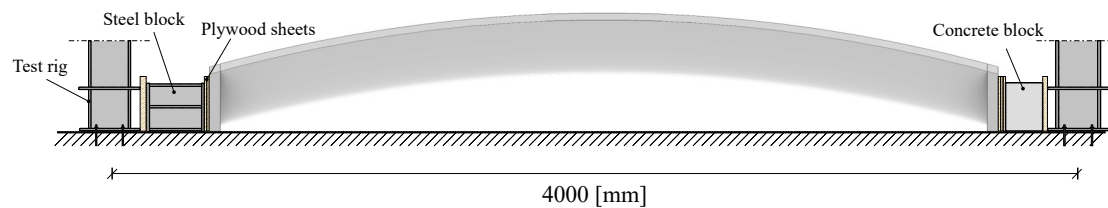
Illustration of support conditions considered during static load testing. The prototype element was placed within the test rig, with steel blocks, concrete blocks and plywood sheets added to minimise the gap between the element and the test rig, and to ensure adequate load transfer.
